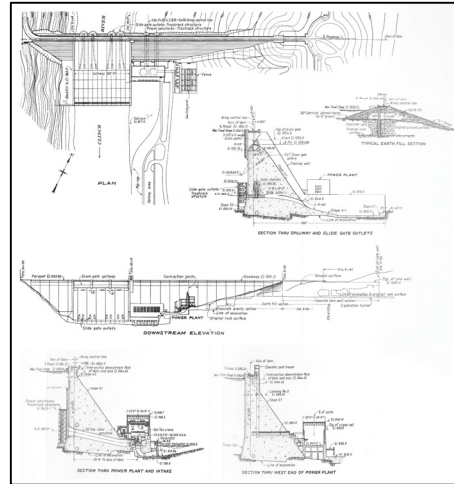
Norris Dam Plans, Elevations and Sections. (*A Technical Review of the Norris Project 1937*)
